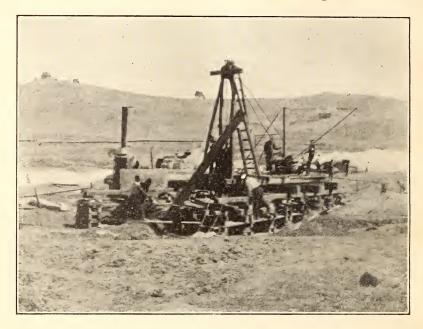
Driving interlocking steel sheet piling, Silver Lake Dam, Cal.
